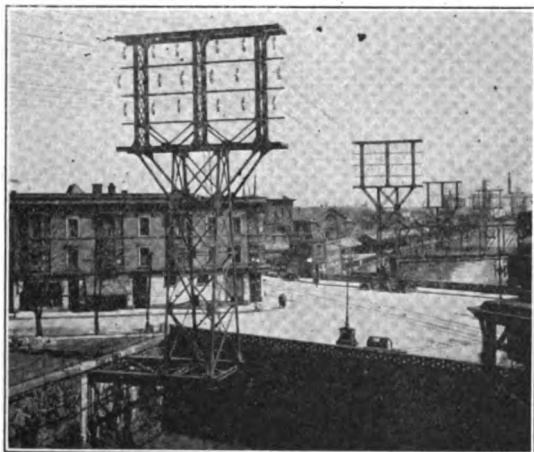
TRANSMISSION LINE CROSSING STREET INTERSECTION SHOWING LONG CANTILEVER FOUNDATIONS
